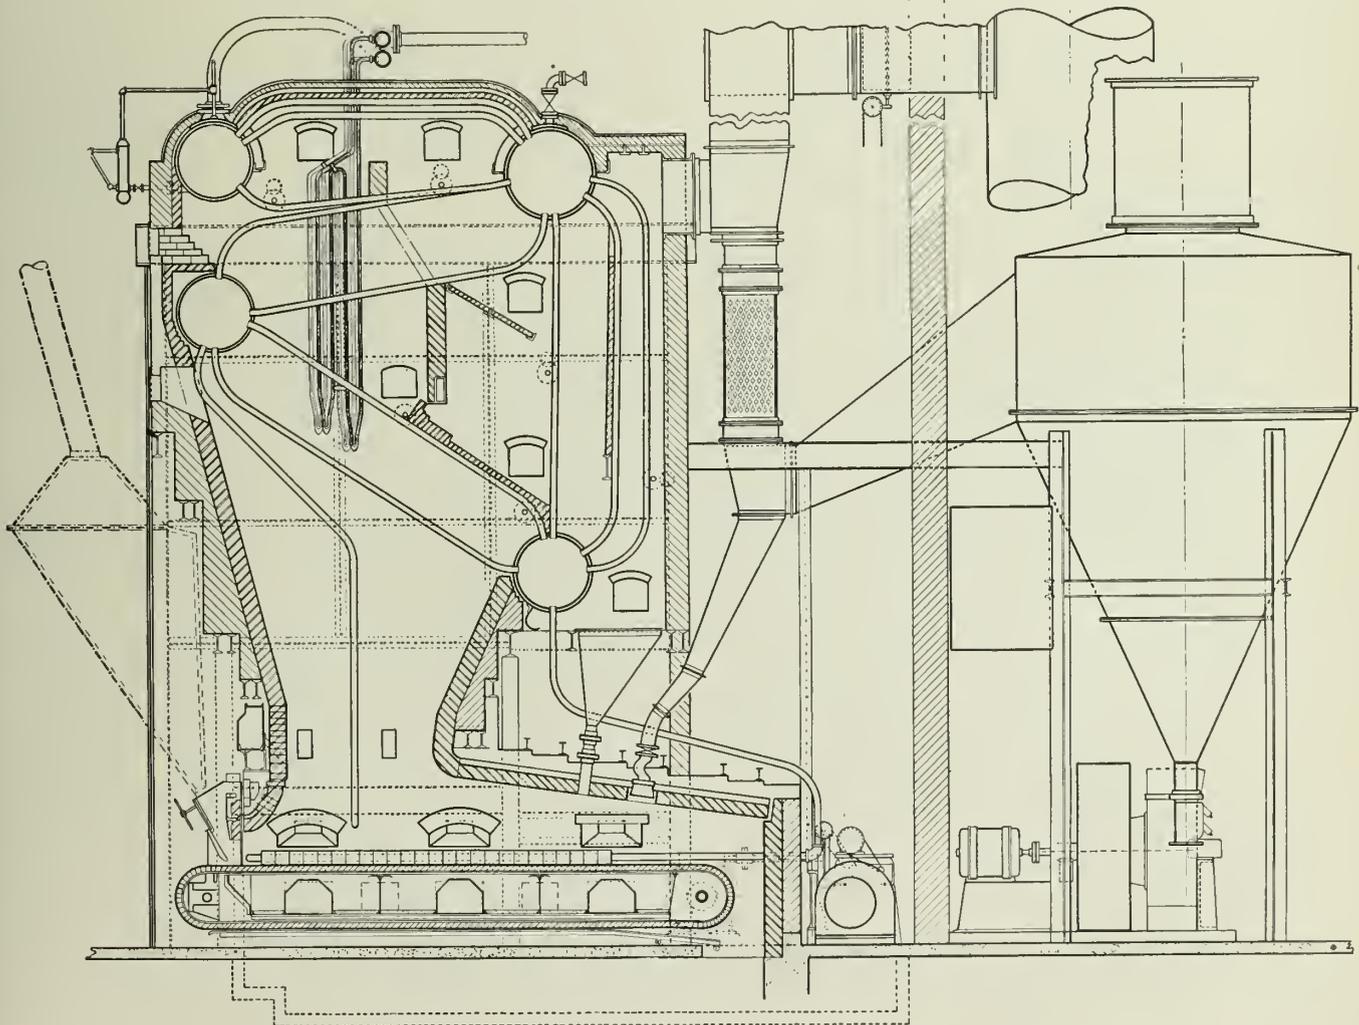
Section Through Boiler Installation showing Dust Collector and Economizer.
